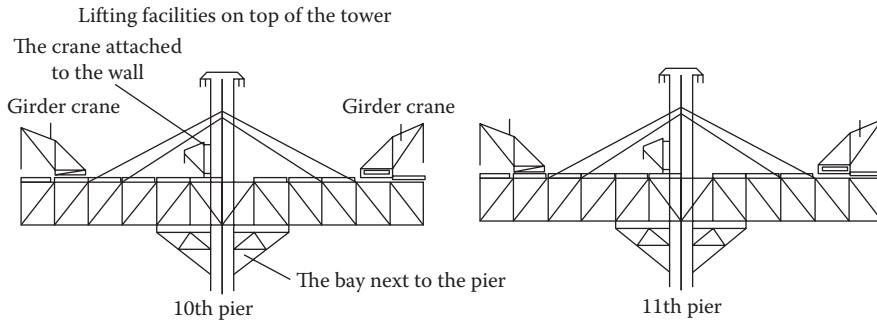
Steel girder erection. (From Zhou, M. B., *Bridge Construction*, (2): 14–19 (in Chinese), 2000a.)
